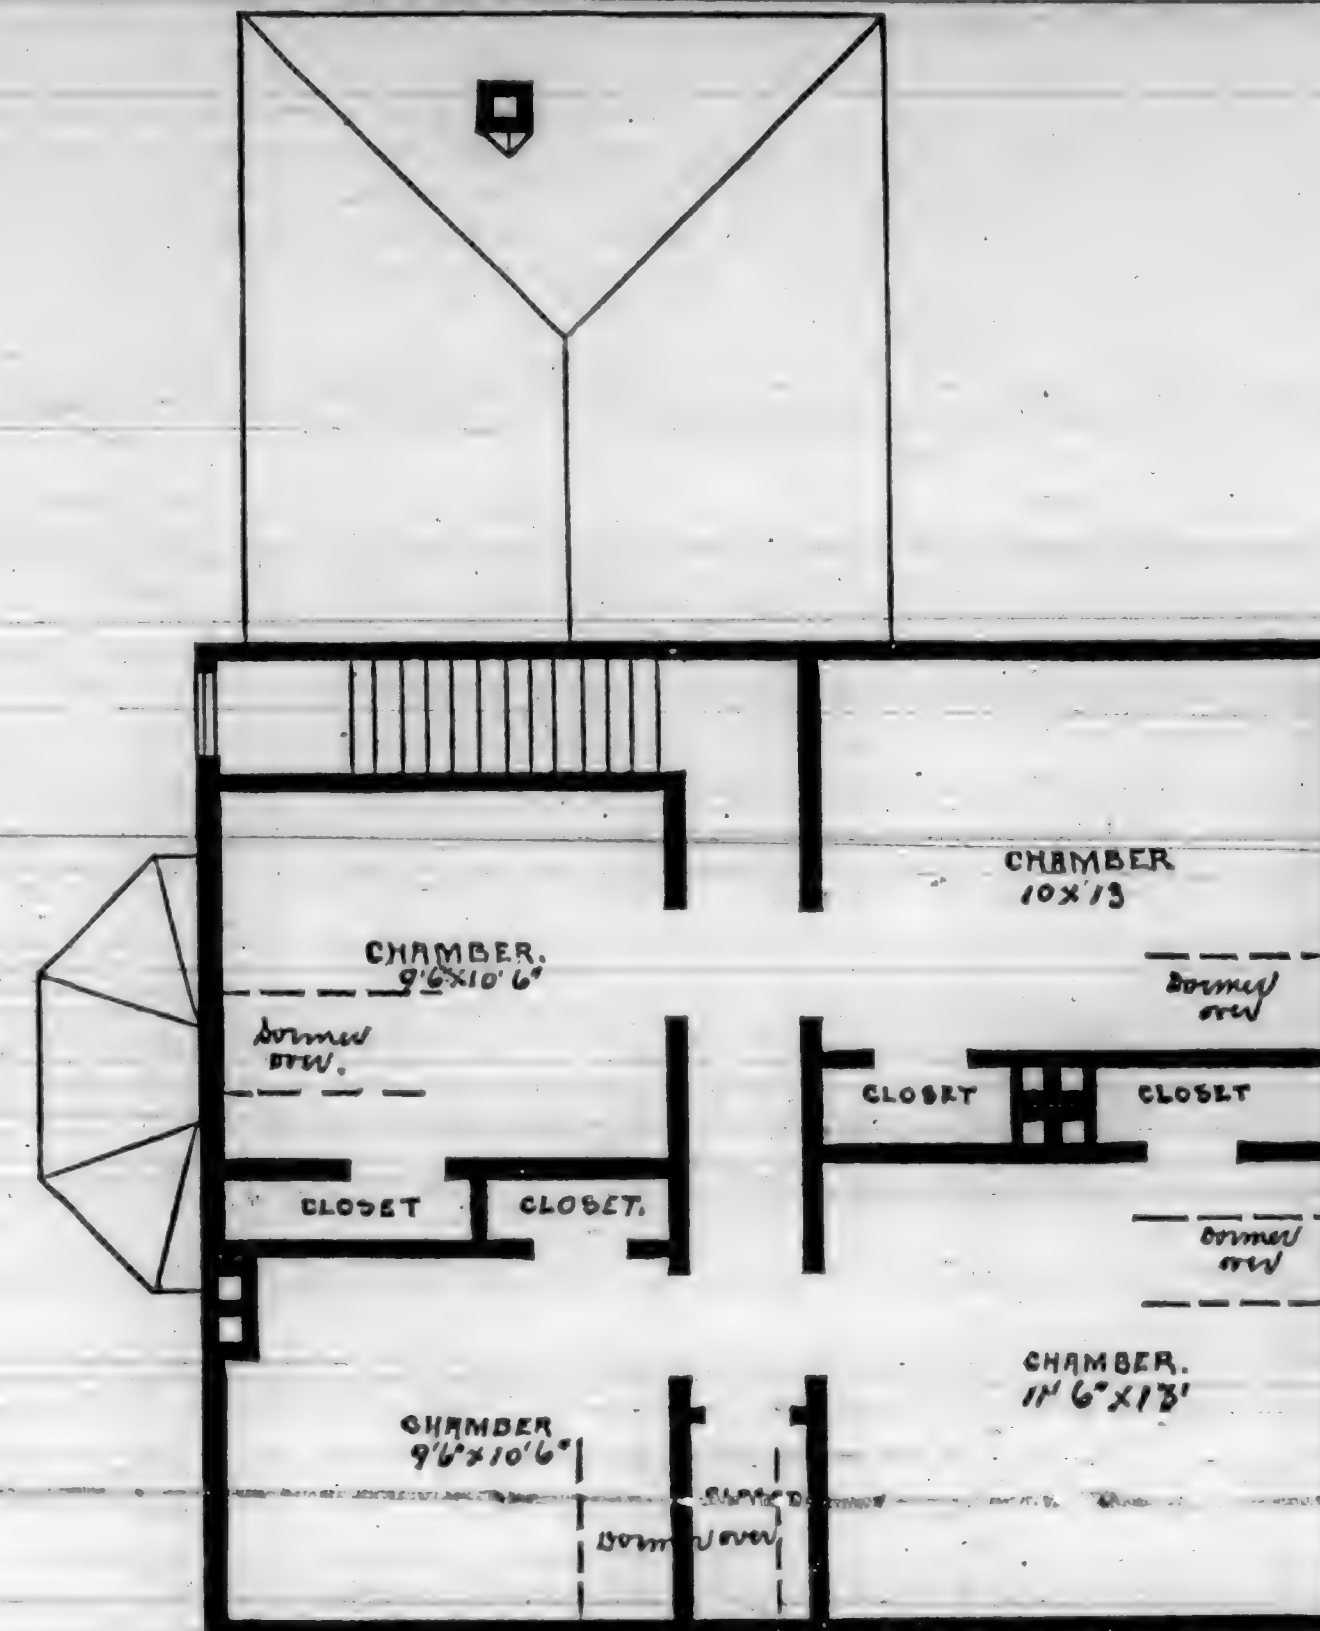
SECOND FLOOR PLAN \$3,000 DWELLING.
